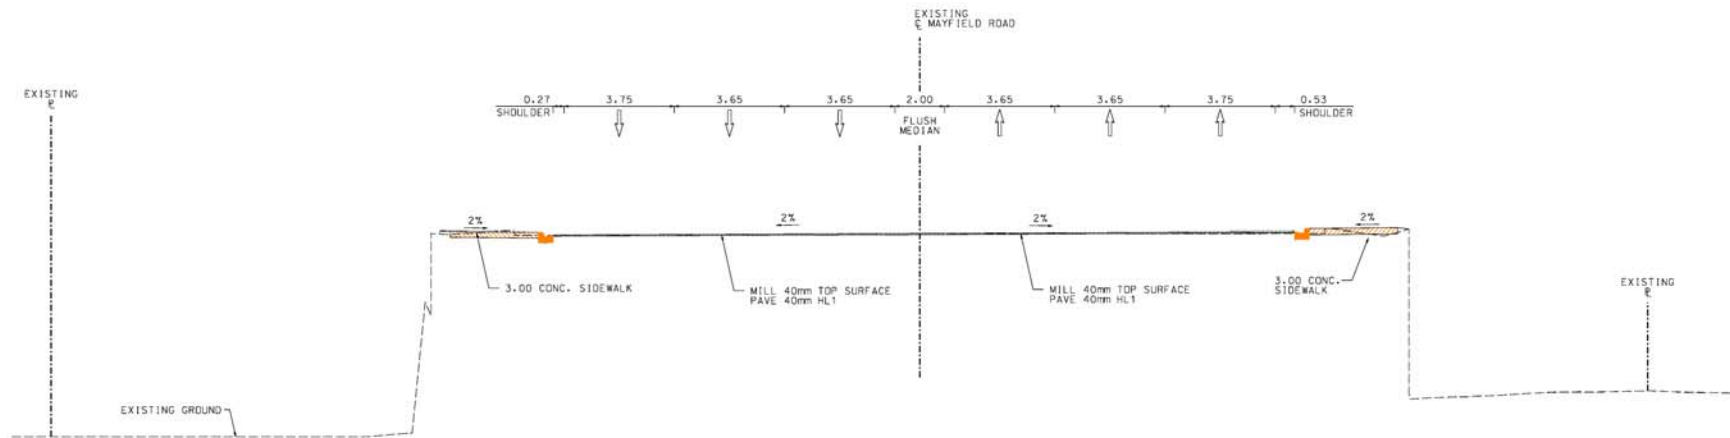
Kennedy Road to Stonegate Drive Typical Cross Section
